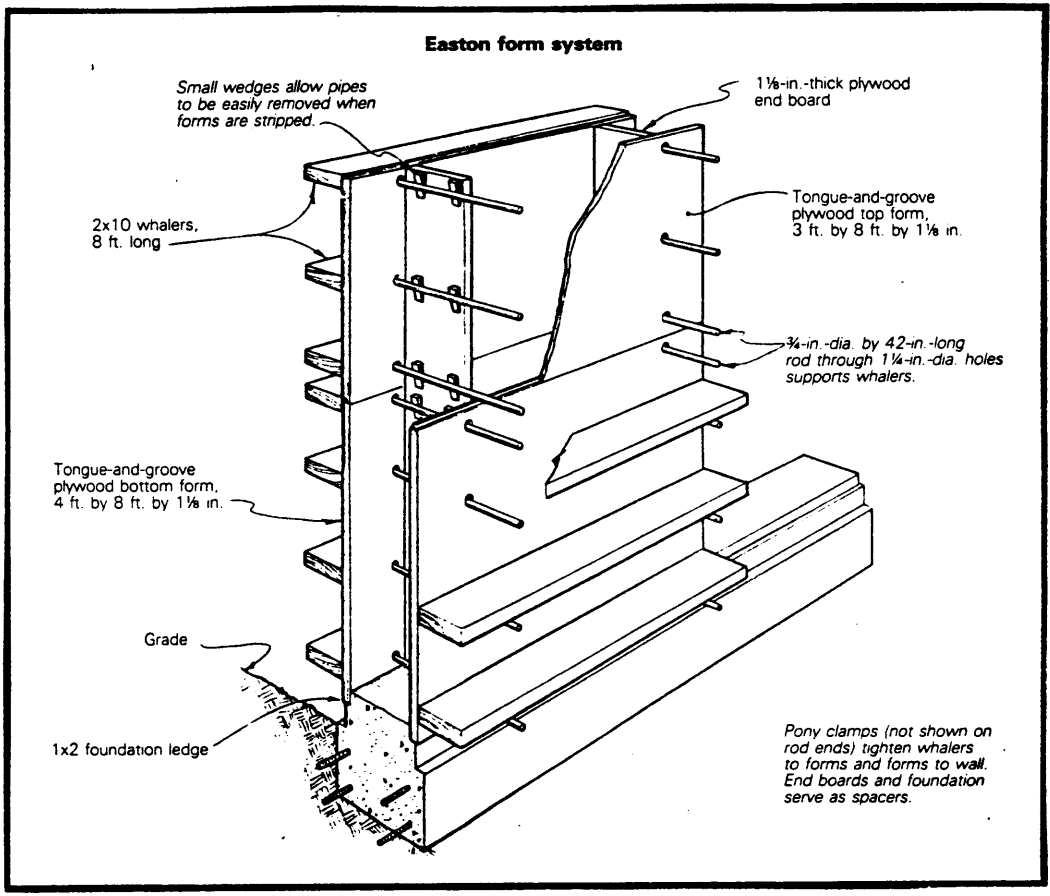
A highly sophisticated system for constructing rammed earth buildings in the southwestern U.S.A.
